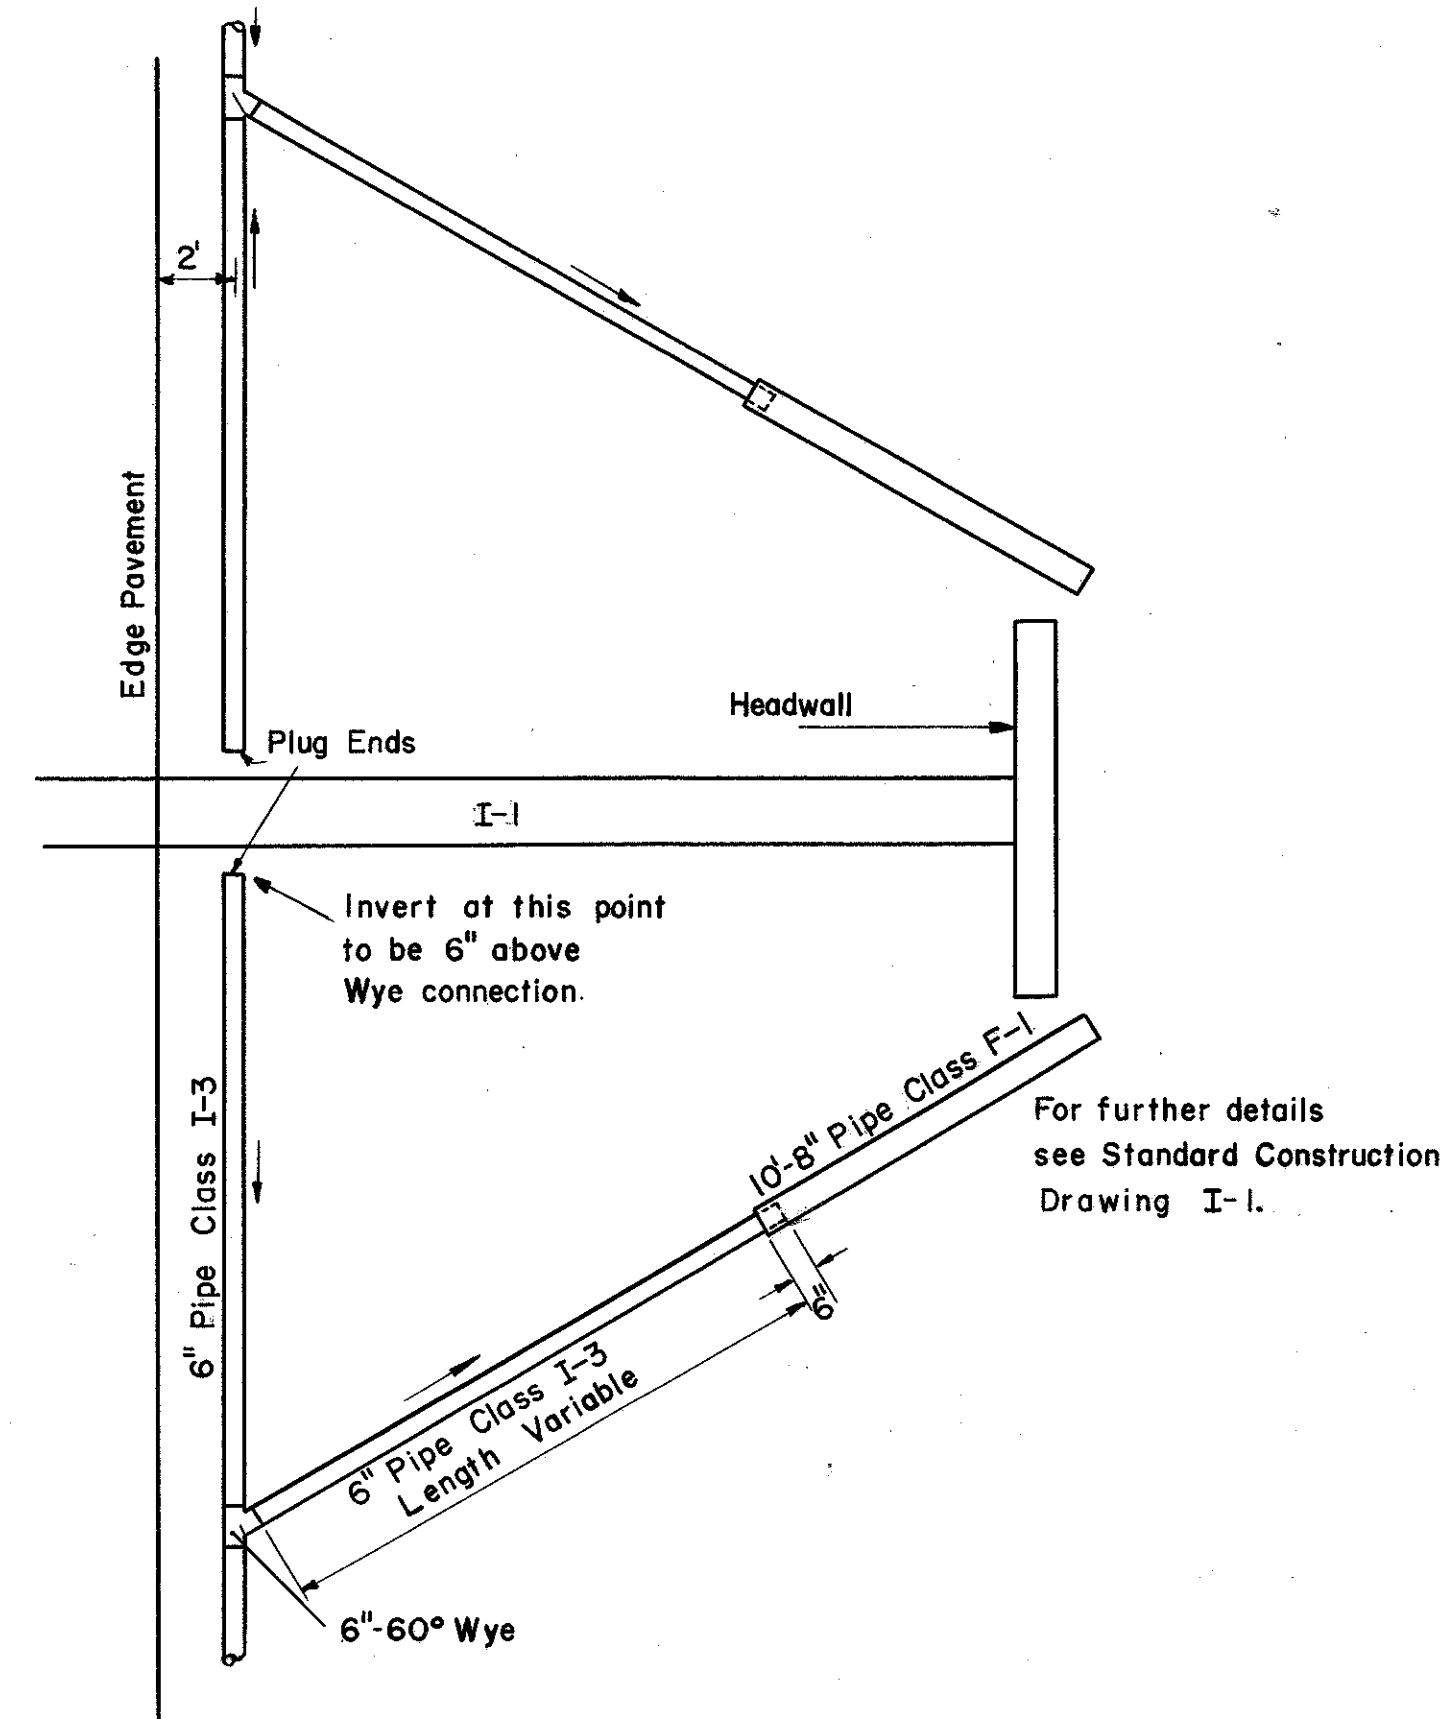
DETAIL OF TRANSVERSE DRAIN AT CUT TO FILL SECTION
